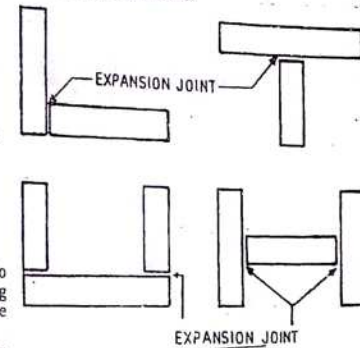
Plans showing location of expansion joint in buildings of different shapes
